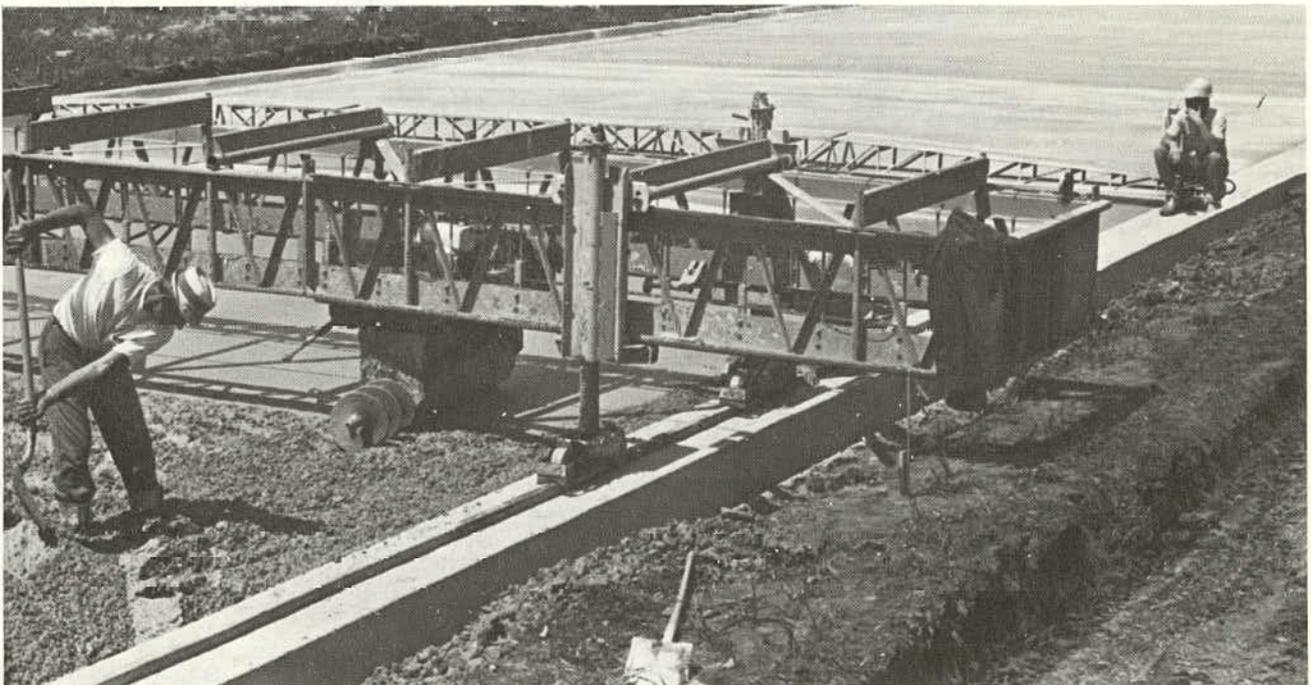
Slip-forming a 48-ft-wide pavement between previously slip-formed curb and gutter.
